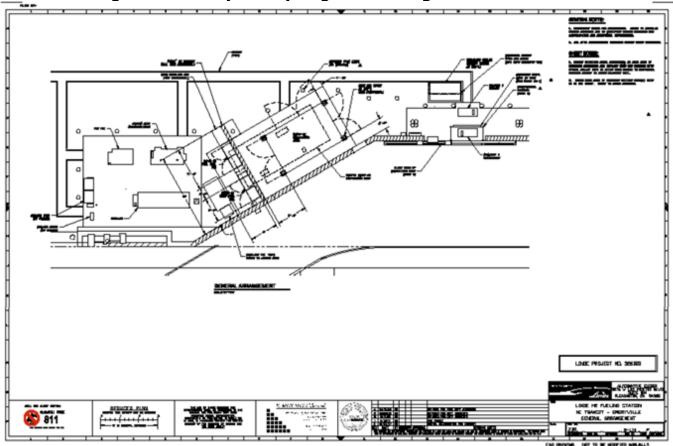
Emeryville Hydrogen Refueling Station Plot Plan
